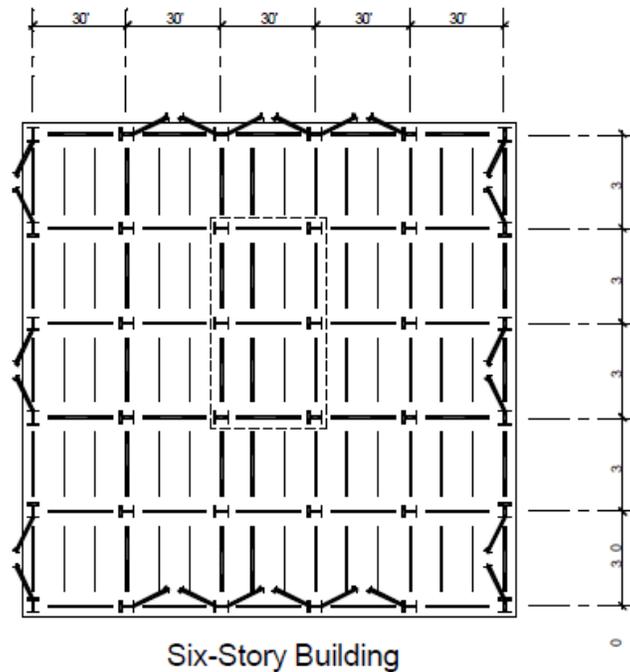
Plan View of the Six-Story BRB Braced Frame Structure (Sabelli, 2001)
